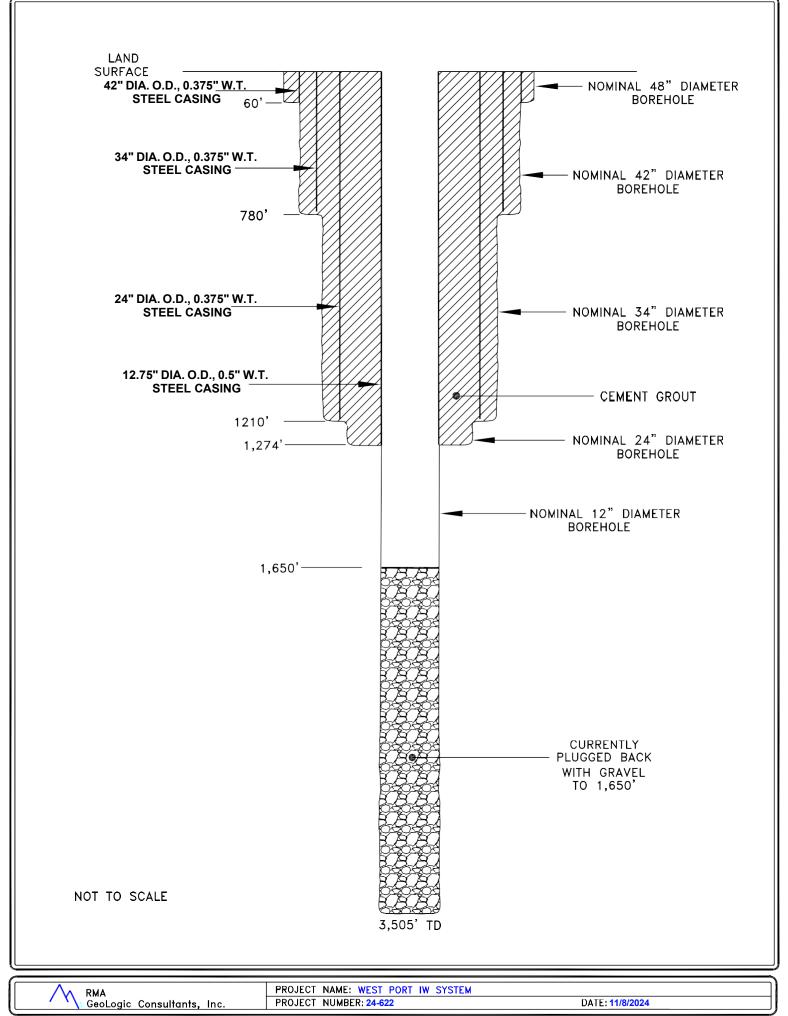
SCHEMATIC DIAGRAM SHOWING CONSTRUCTION DETAILS FOR WEST PORT INJECTION WELL IW-1.
